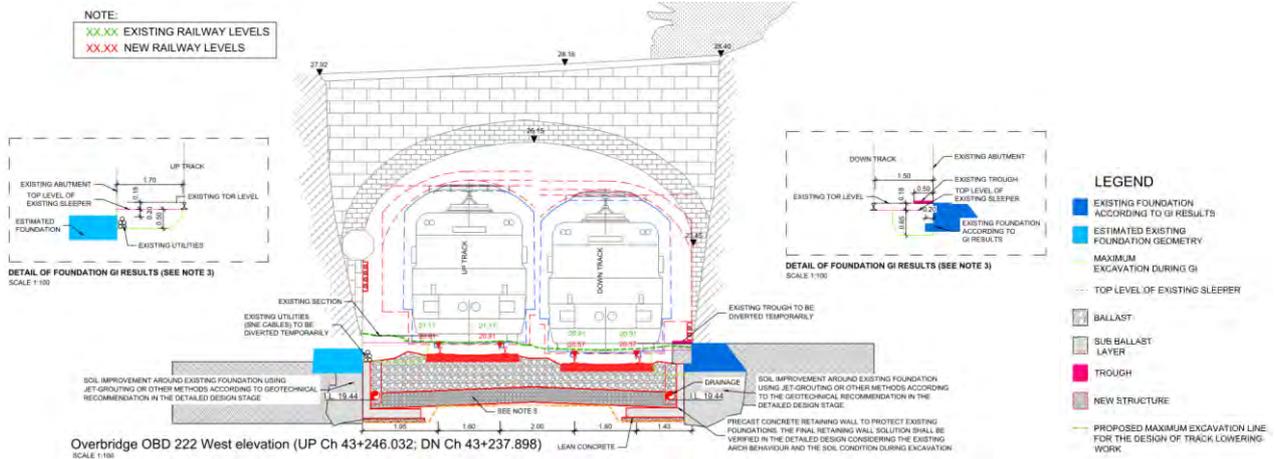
Section showing proposed L-form retaining walls at OBD222
